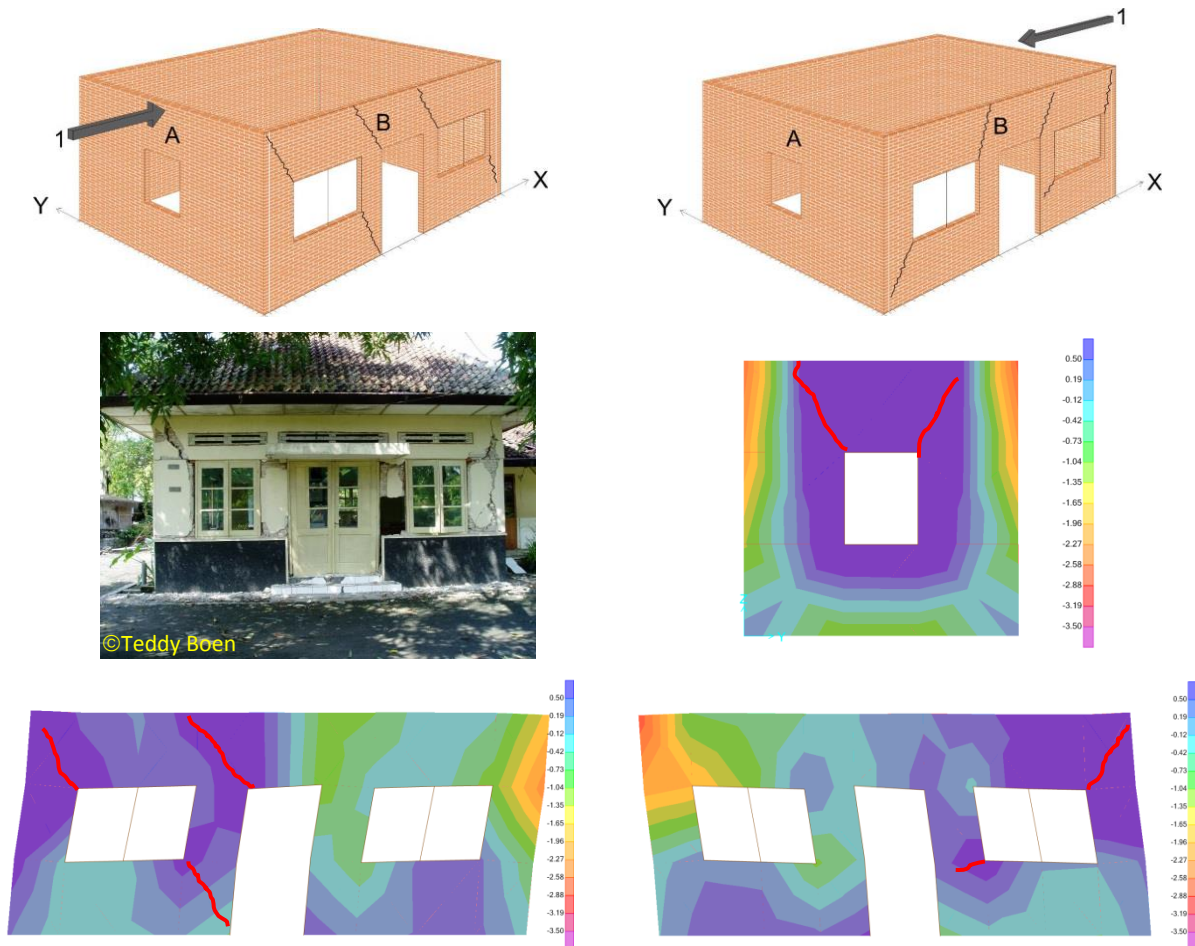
Cracks and Tensile Stresses Pattern of a Shear Wall with Openings – Red Lines: Probability of Cracks
